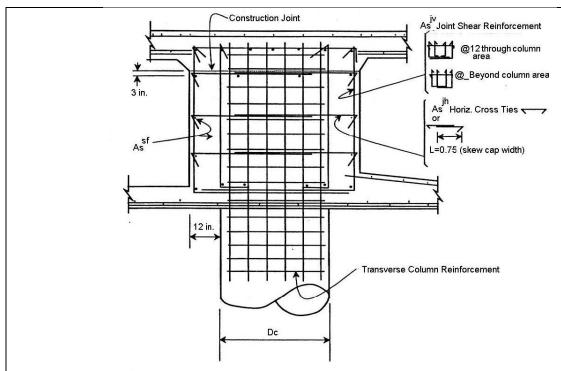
Joint Shear Reinforcement Details
